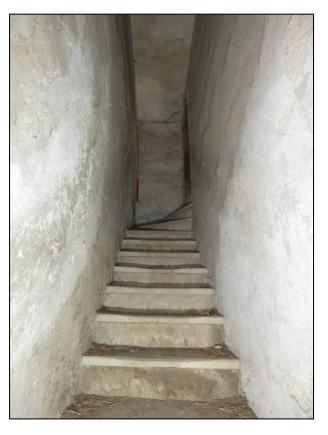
South range, western stairs to first floor rooms, looking NW (photo 1/796).
